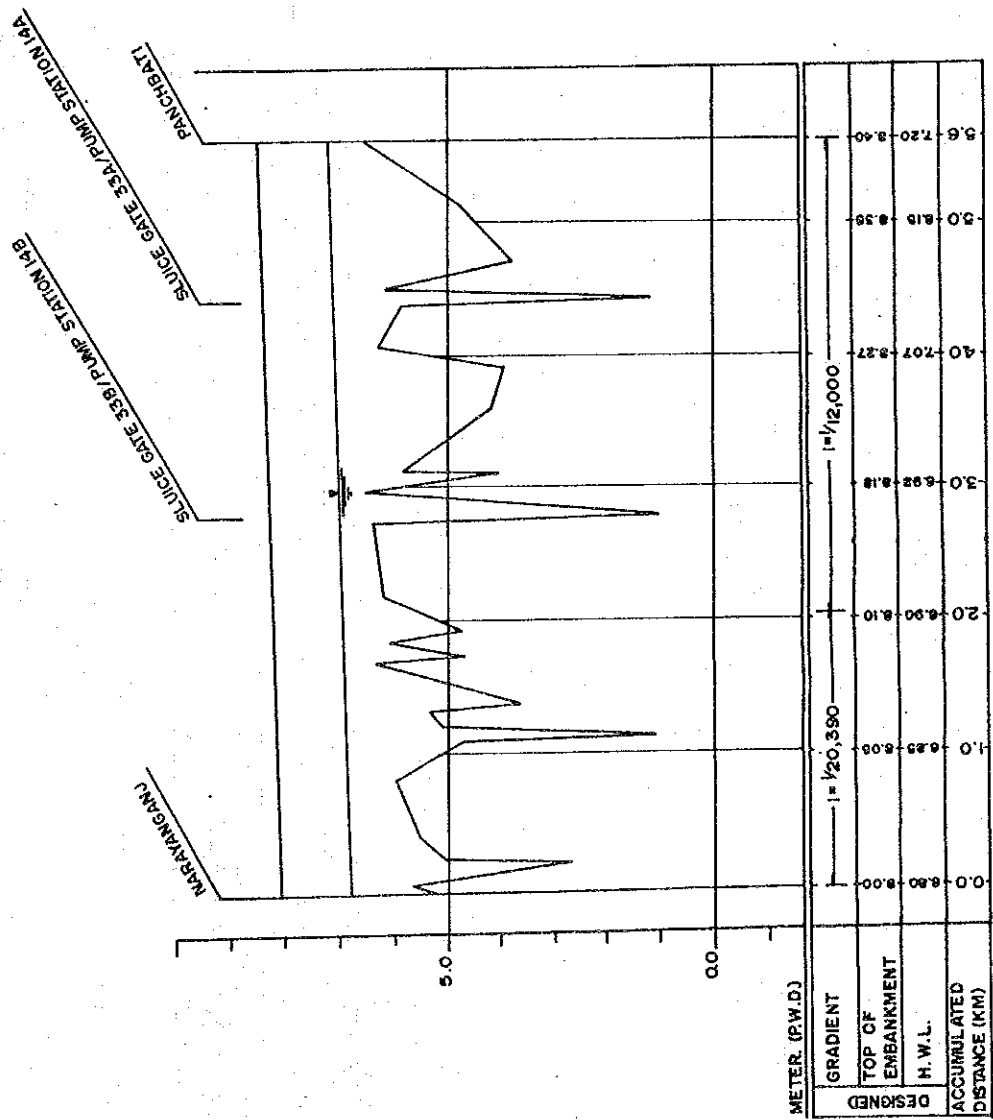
(1) LONGITUDINAL SECTION OF EMBANKMENT ROAD-CUM-EMBANKMENT (NW) NARAYANGANJ WEST
